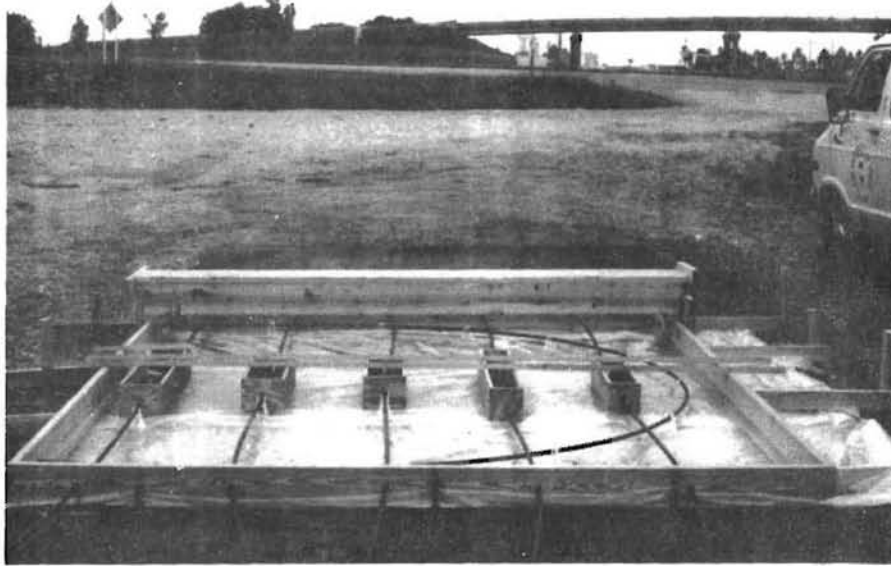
Layout of Test Slab No. 1 before casting the concrete.
